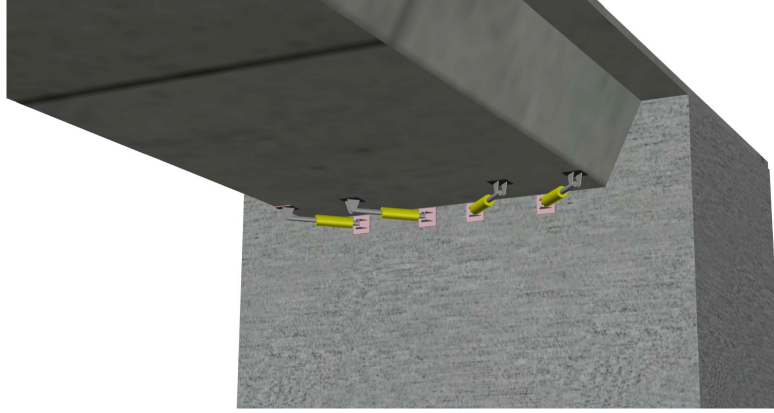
3D view of the MR dampers installed between the deck and abutment
